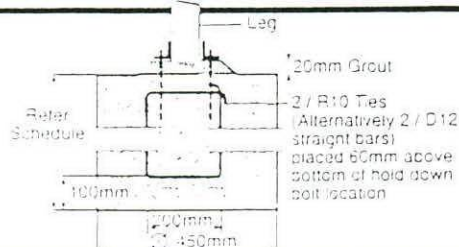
, c & d are NOT to be used in New Zealand conditions refer to SLAB AND FOUNDATION SCHEDULE attached to plans, for detailed drawings.
